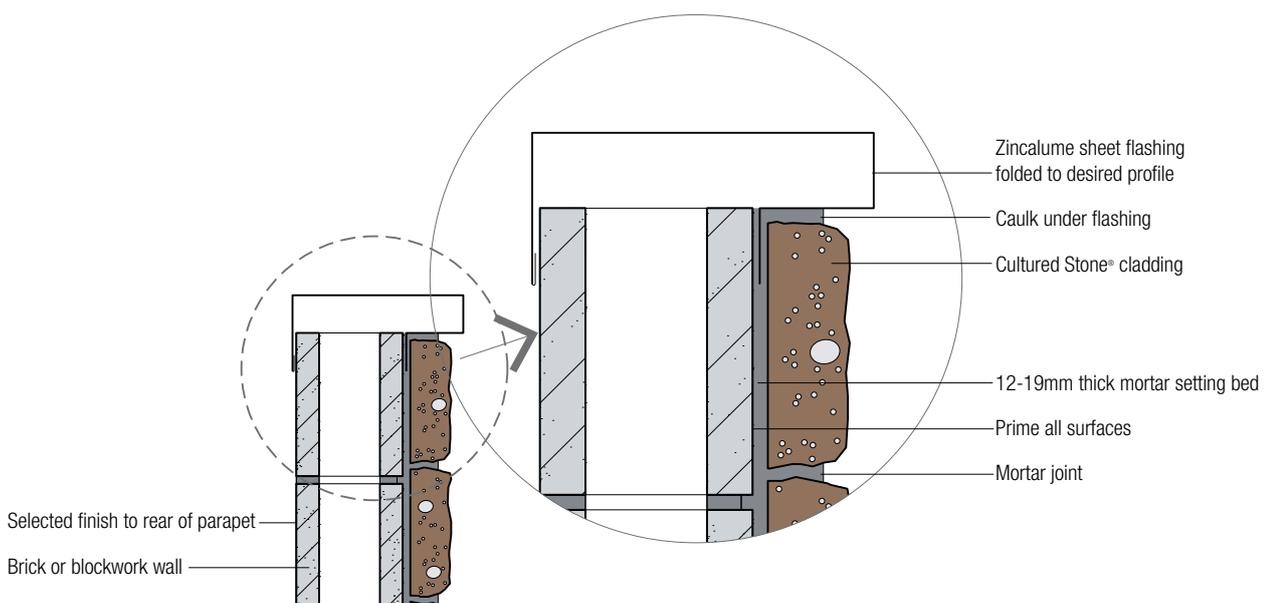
Brick or Block Work Parapet Flashing Capping - Section (Dwg # CS-11.03)
